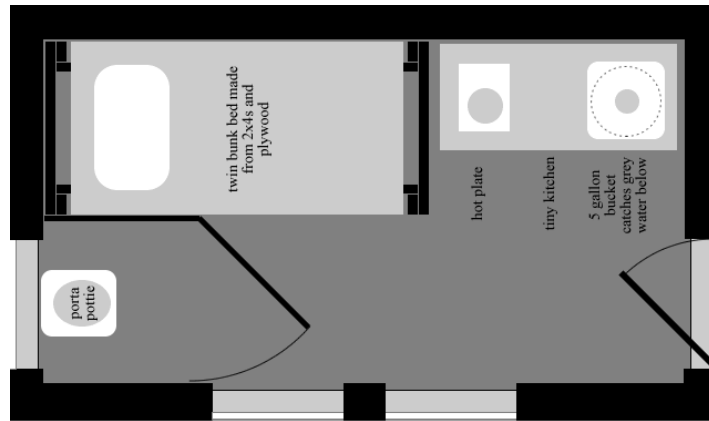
The concept of the prototype plan in a pallet house (<http://www.tinypalletehouse.com>).
